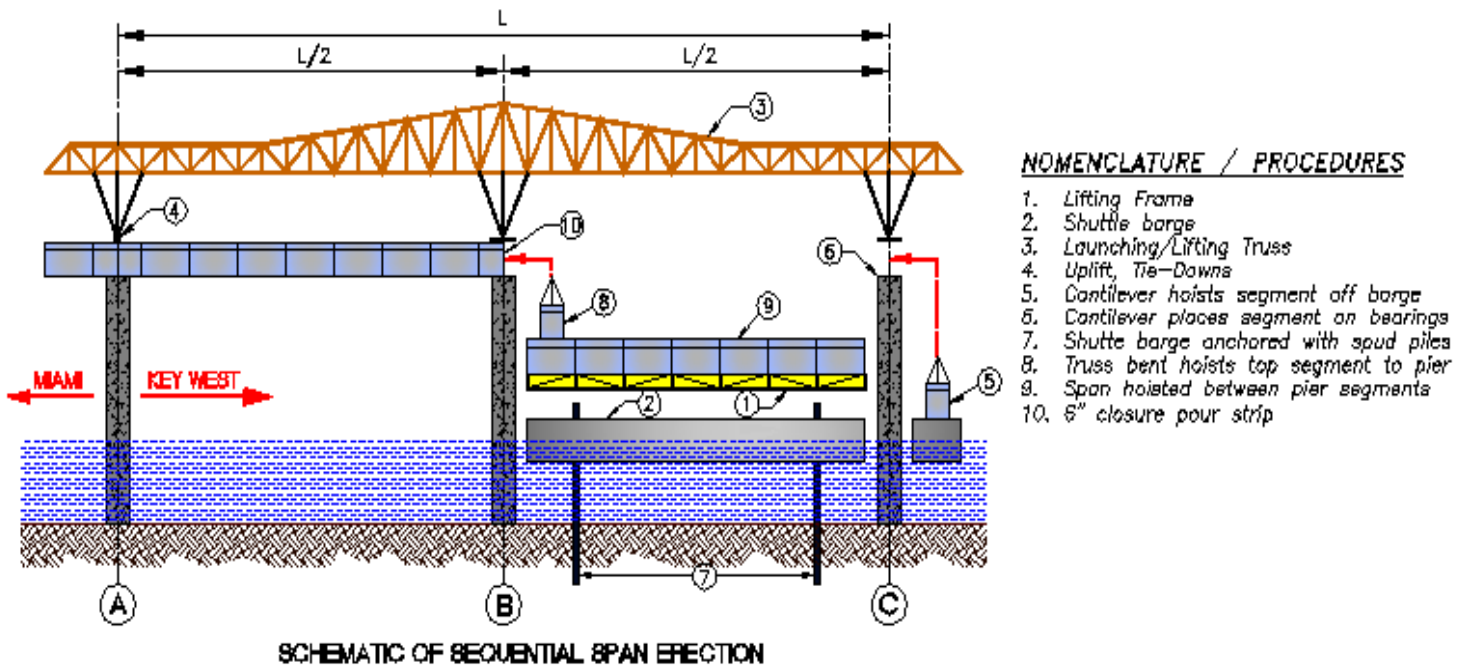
Cantilevered erection of Miami Segment at "C", with bent erection of Key West Pier Segment at "B" followed by bent erection of span "B"- "C".
